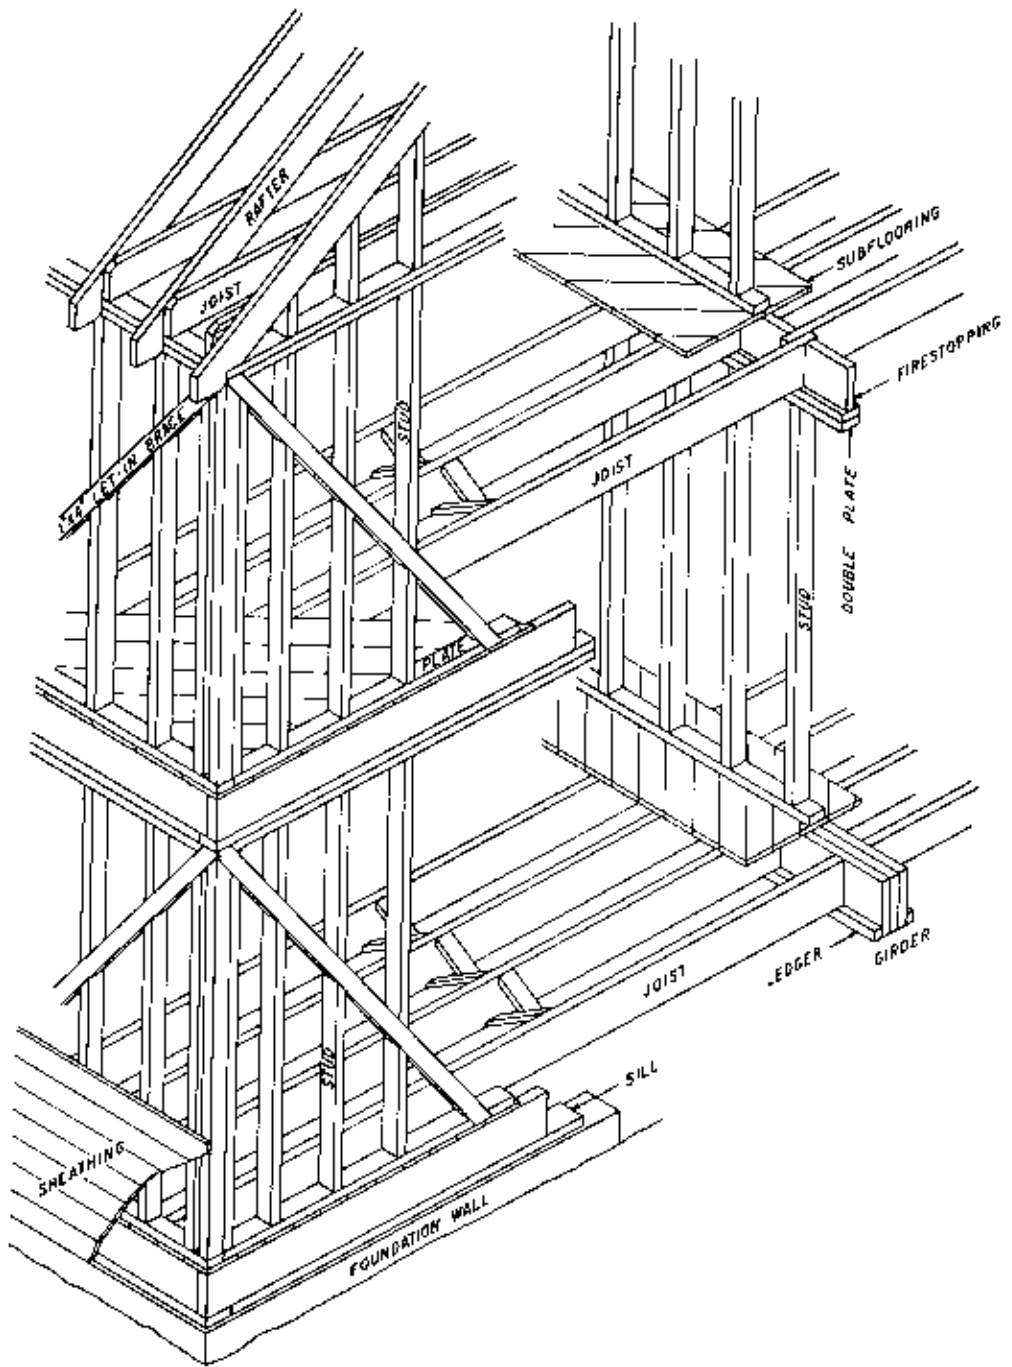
Platform frame construction. (Courtesy of American Forest and Paper Association)
